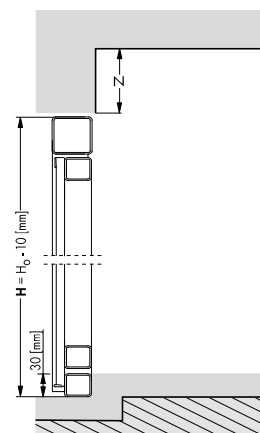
Installation in the opening - vertical section (Komfort, Select, Connect).
